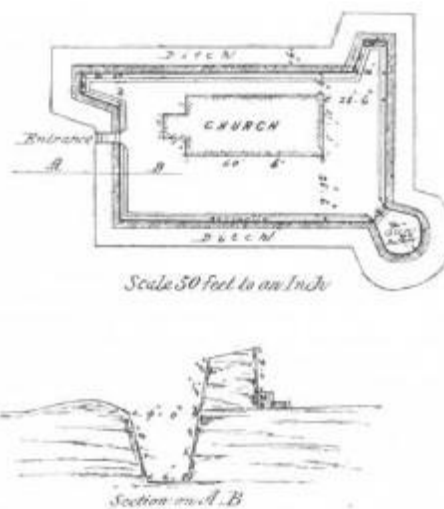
Plan of entrenchment Ōpōtiki Church Redoubt
